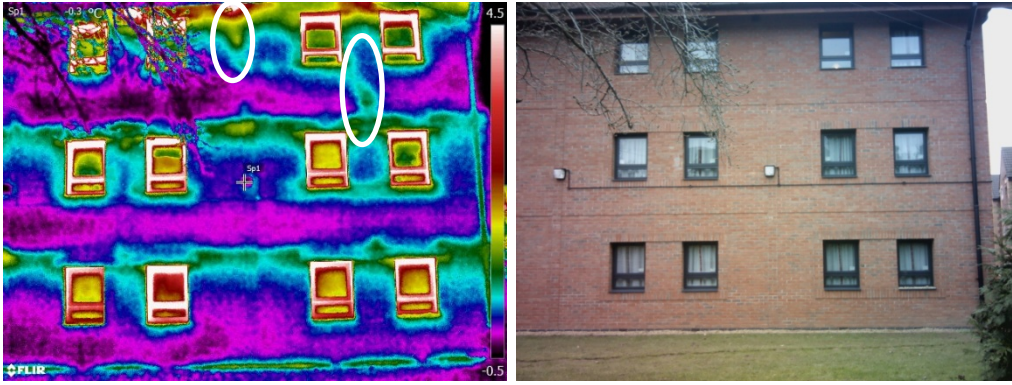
(left): IR thermal image of modular walls with windows with brick cladding, plumes marked
